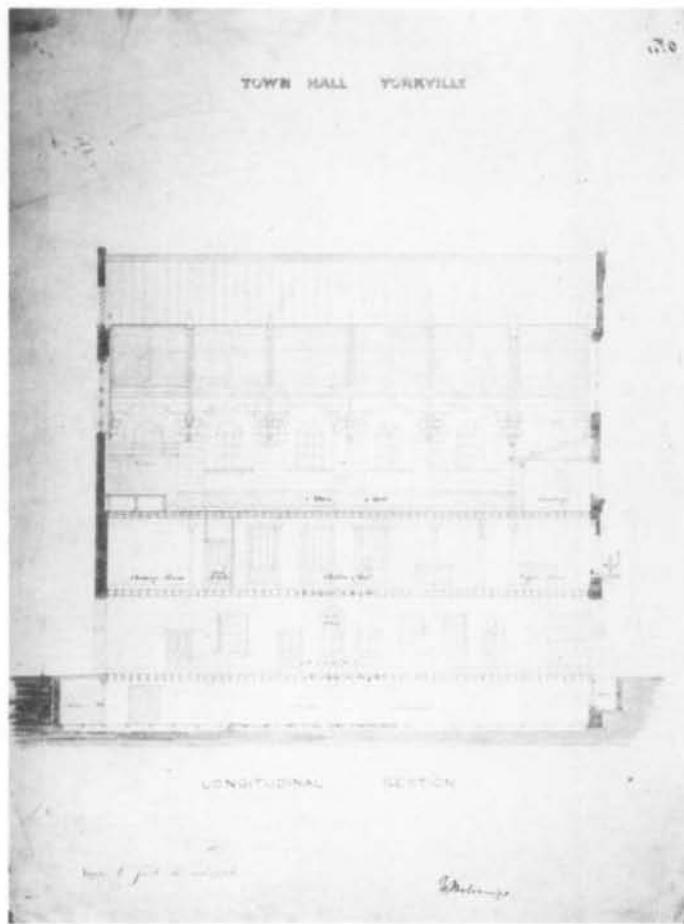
Plan for the Yorkville Town Hall, longitudinal section. (Photo: Langley Coll., Metropolitan Toronto Library Board)
